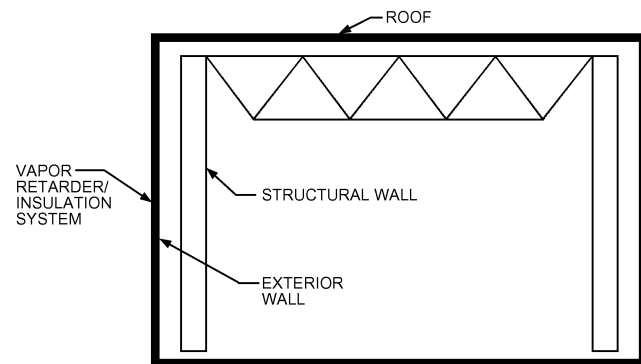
Total Exterior Vapor Retarder/Insulation System
